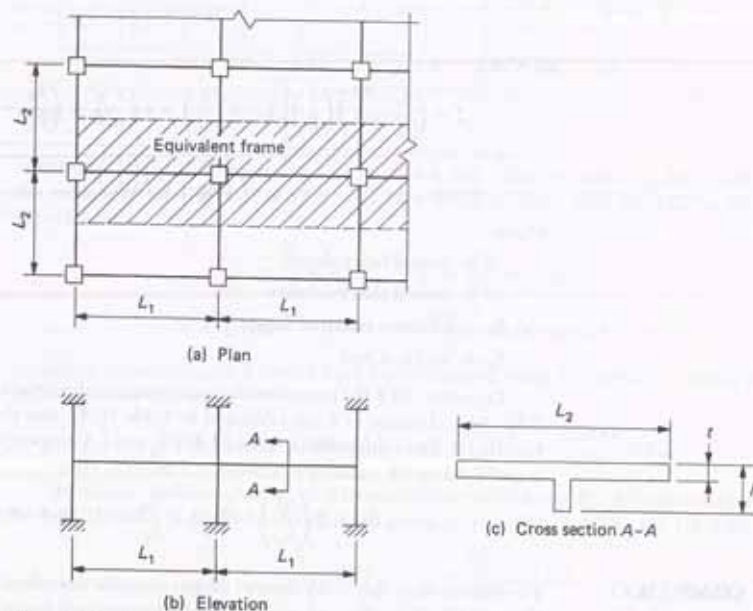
Plan, elevation, and cross-section of equivalent frame in a two-way floor system.
